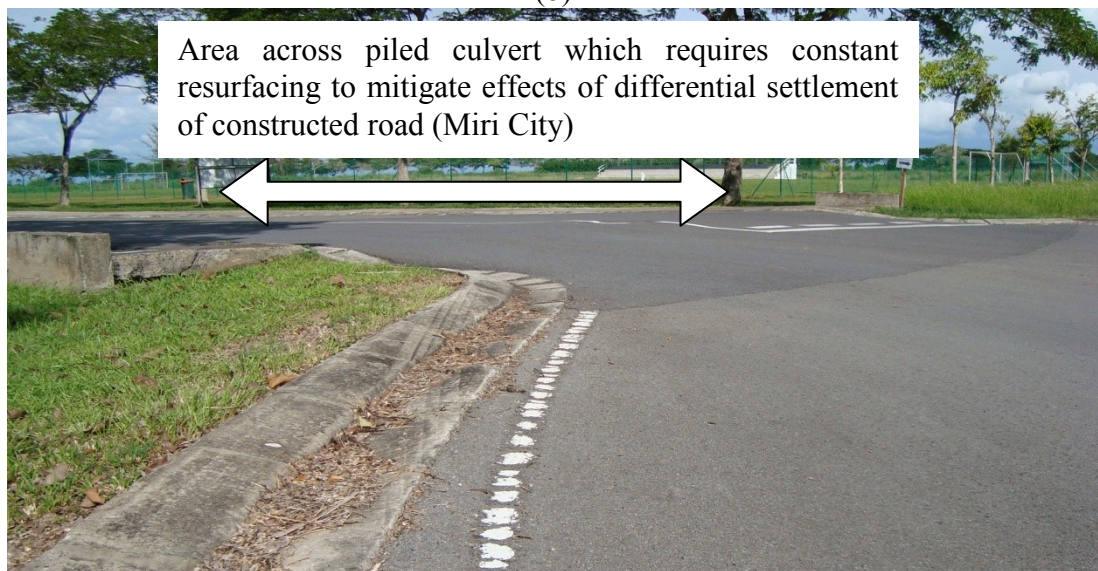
(a) and (b) show the post construction settlement problems that occur in the years after completion of a construction. Gaps are created around constructed buildings as the external road and walkway undergo settlement. To allow accessibility to the buildings, extra steps have to be constructed to bridge the gap. Figure 1.2(c) shows the differential settlement occurring between a piled culvert and completed road. As the road settles, the top of the culvert creates an uneven surface on the road. With further settlement, resurfacing of the road is required to mitigate the uneven road surface due to settlement.
